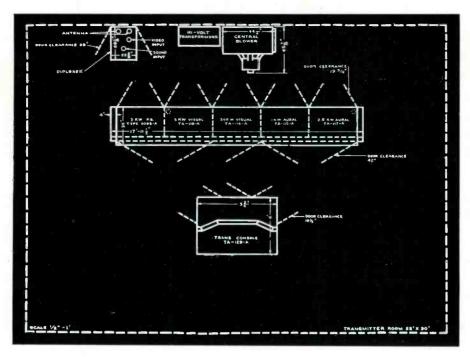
• Conventional arrangement of the five units comprising the Du Mont Master Series Transmitter, with the Control Console, and indicating dimensions and clearances.
